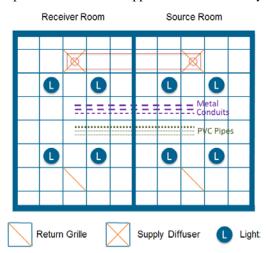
Reflected ceiling plan of test chambers showing locations of lights, return grilles, supply diffusers, supply duct, pipes and conduits.
